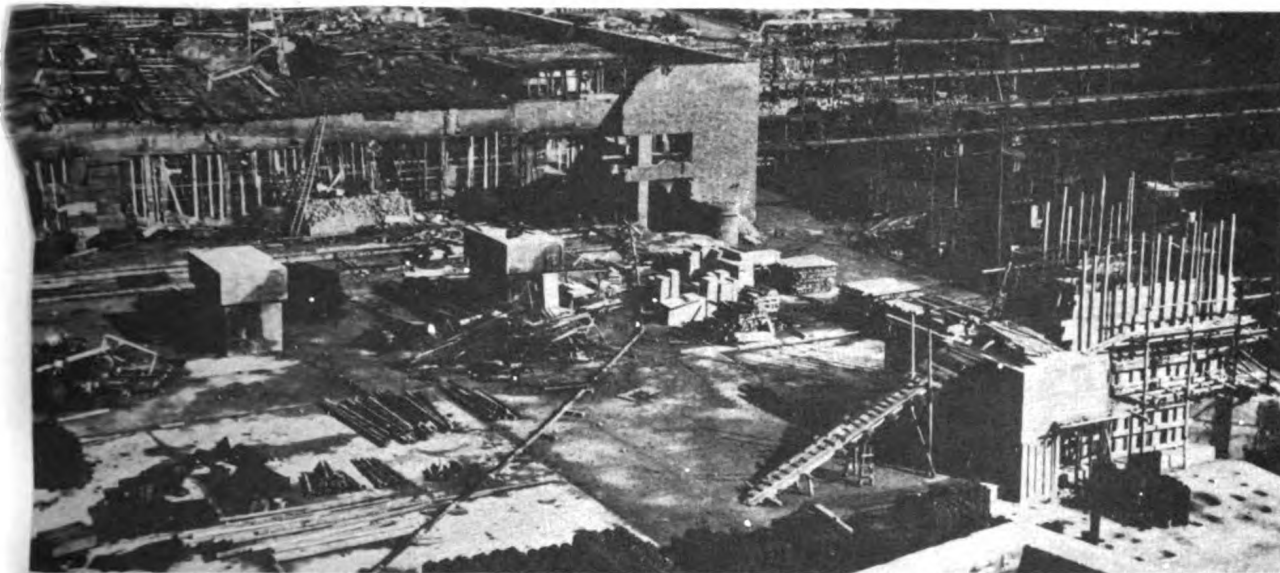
View looking northwest - showing 8 ft. thick reinforced concrete roof slab with vent shafts. Note construction in progress to right, and disruptive pattern painting on vent shafts. Section of repaired Bldg. R in rear. Note unfinished stock piles.
